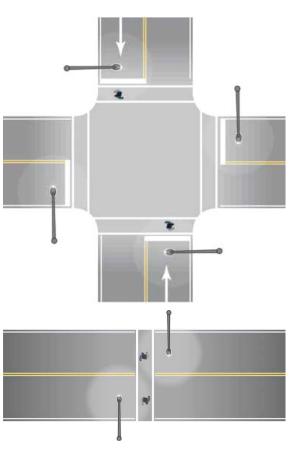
Recommended Location for Luminaires at Intersections and Midblock Crosswalks
